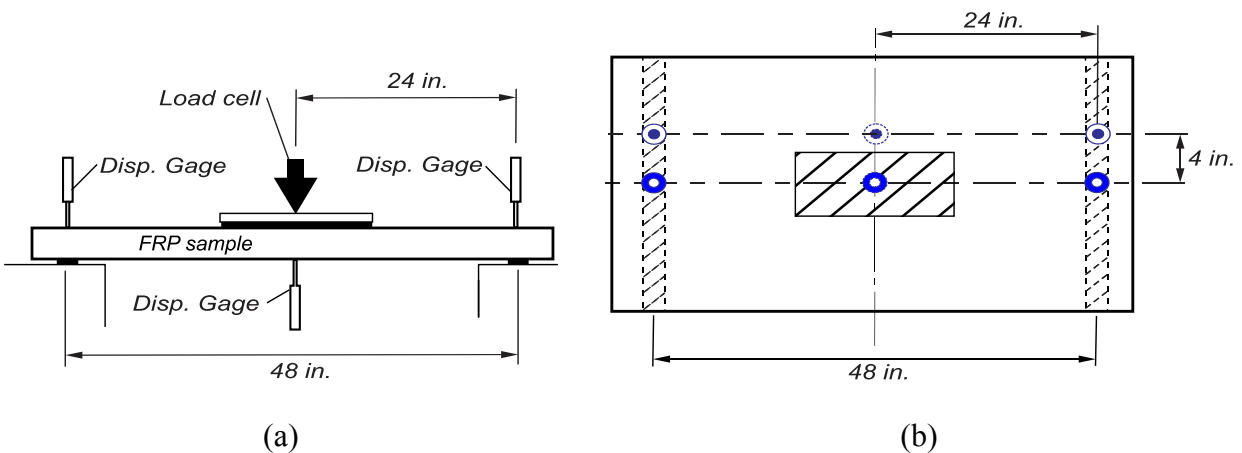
Displacement gage locations positive bending setup (a) elevation and (b) plan view
